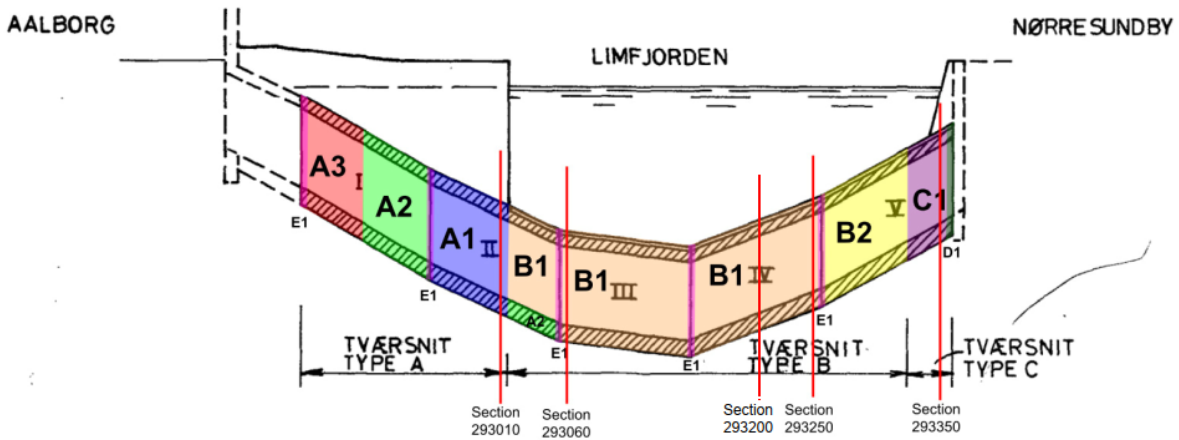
Locations of cross-sections and types of reinforcement arrangements
